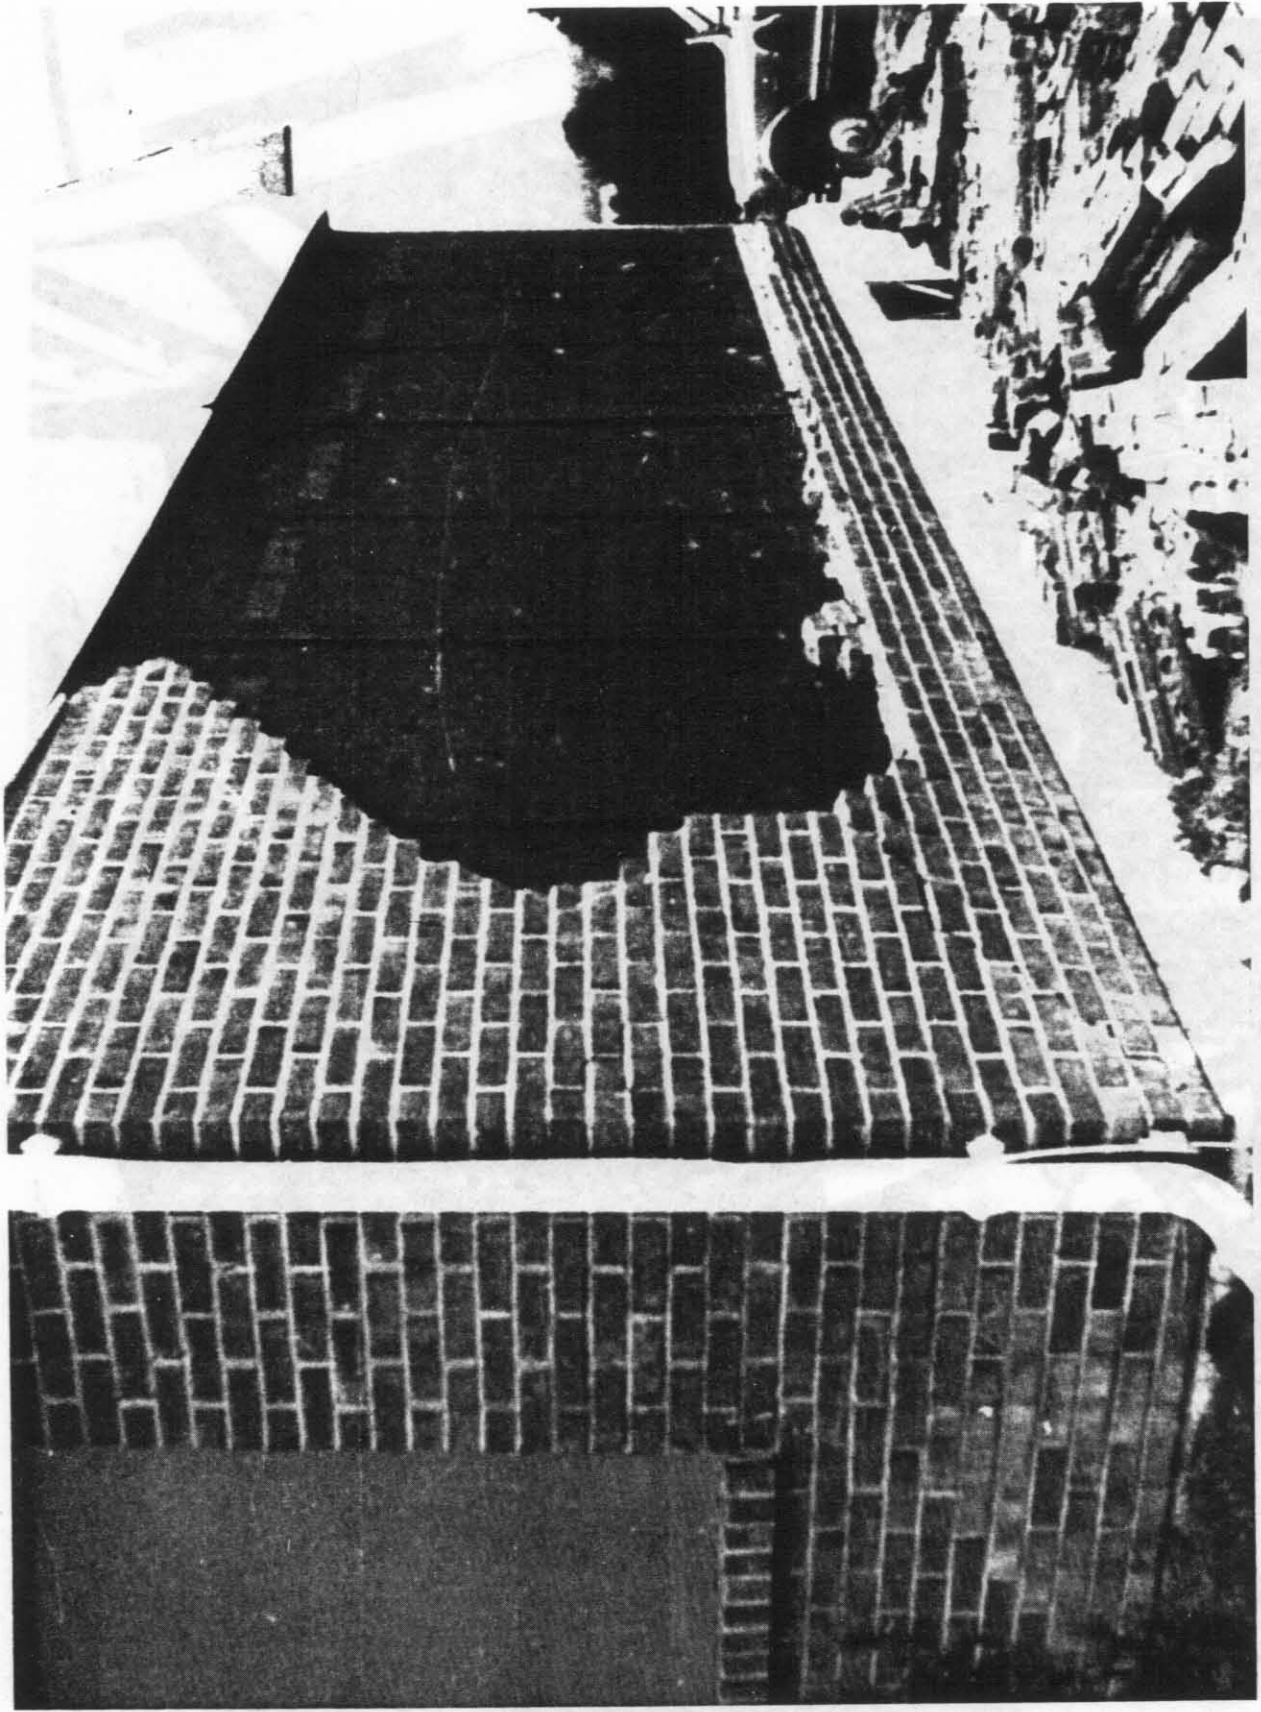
Damage to Morhaus home, about 1,700 feet northeast of center of blast.
